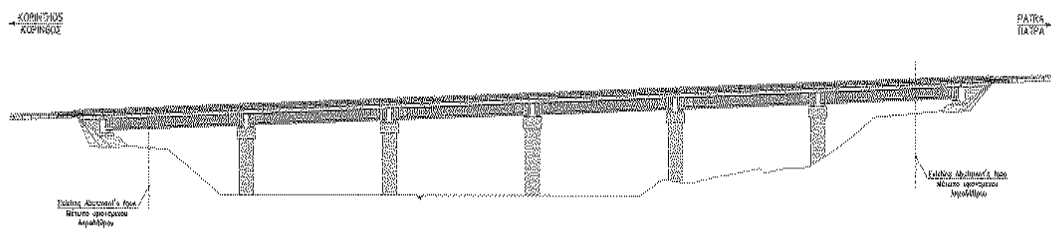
RIVER BRIDGE GRAPH (Source: Author's proposal)
